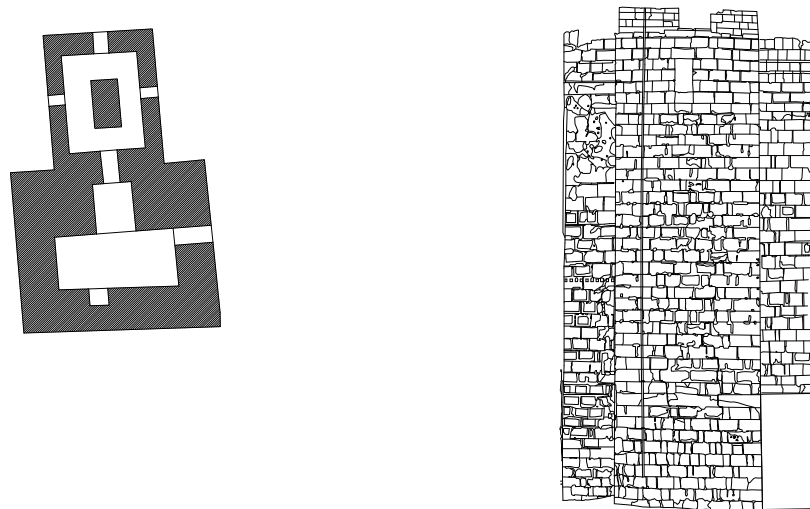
and 6. Ground plan and western façade of Burg al-Rafraf
